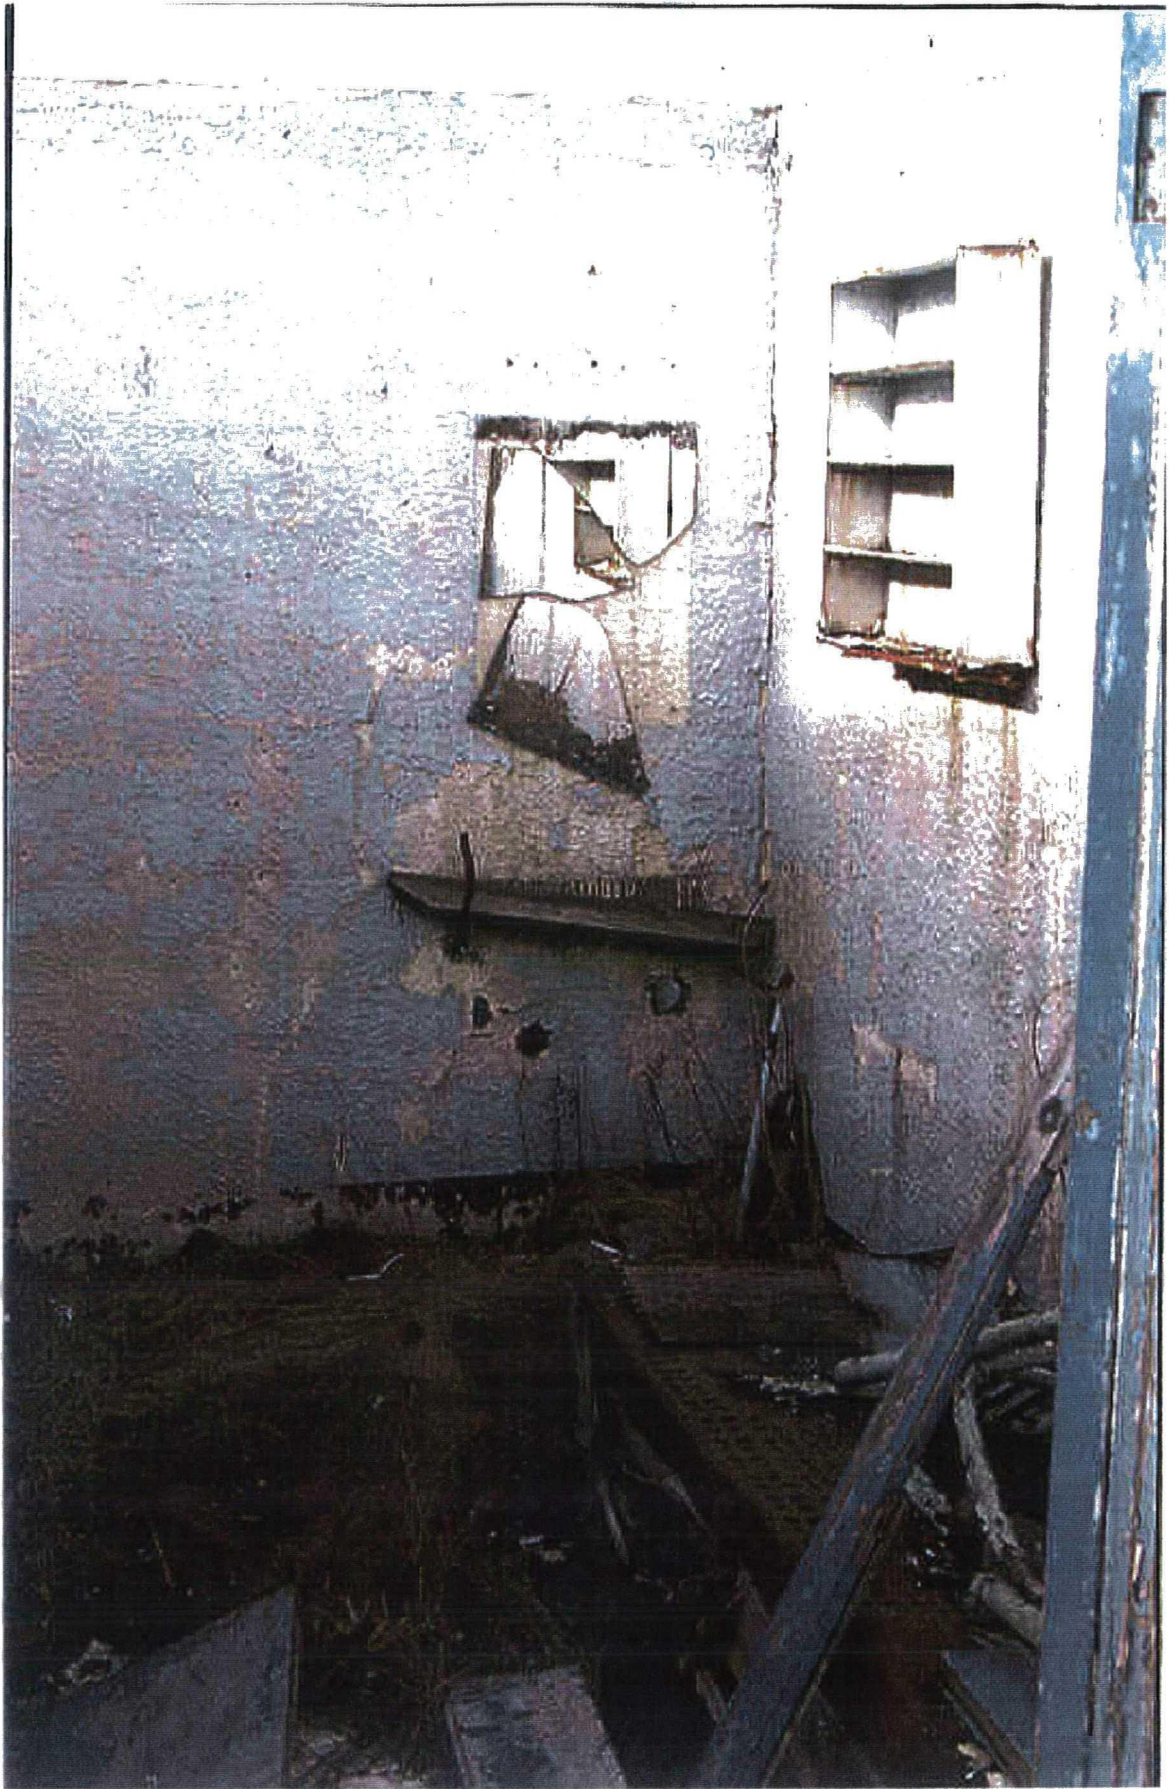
Detail of typical staff chalet interior, still containing most original fittings, although roofless
